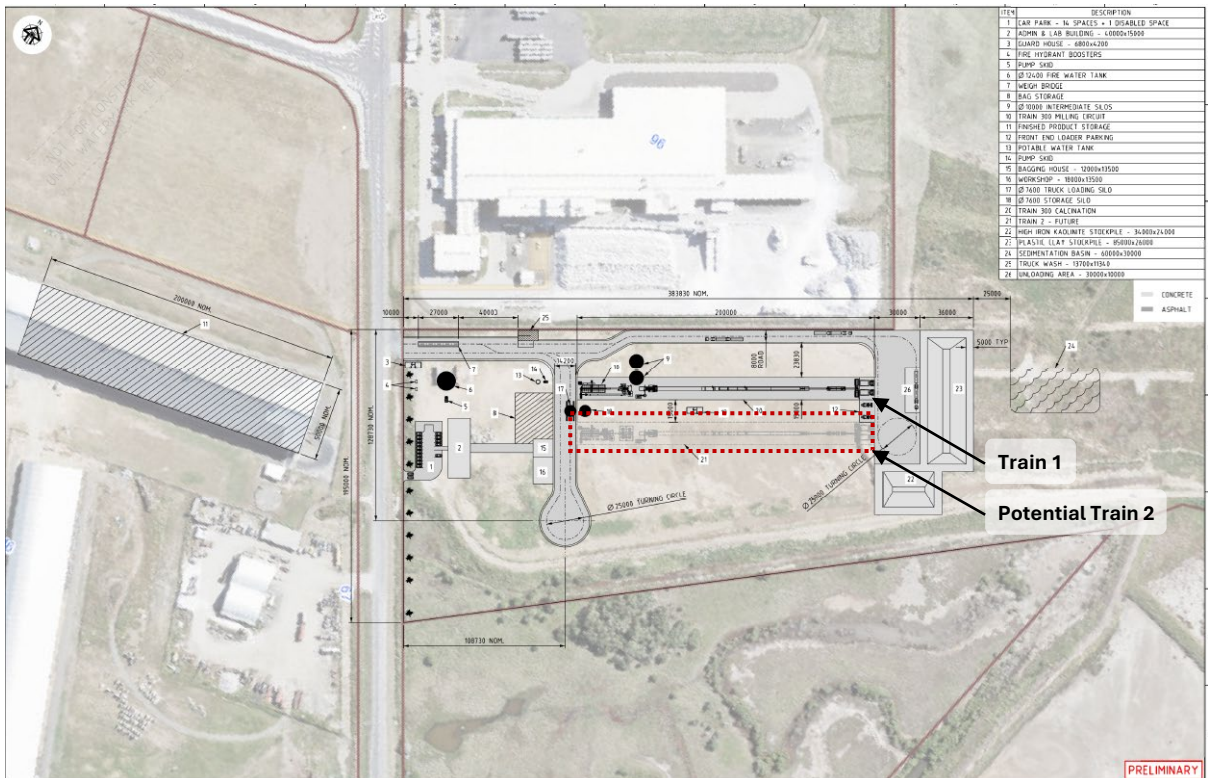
Proposed AusPozz™ Manufacturing Facility Area Site Layout
